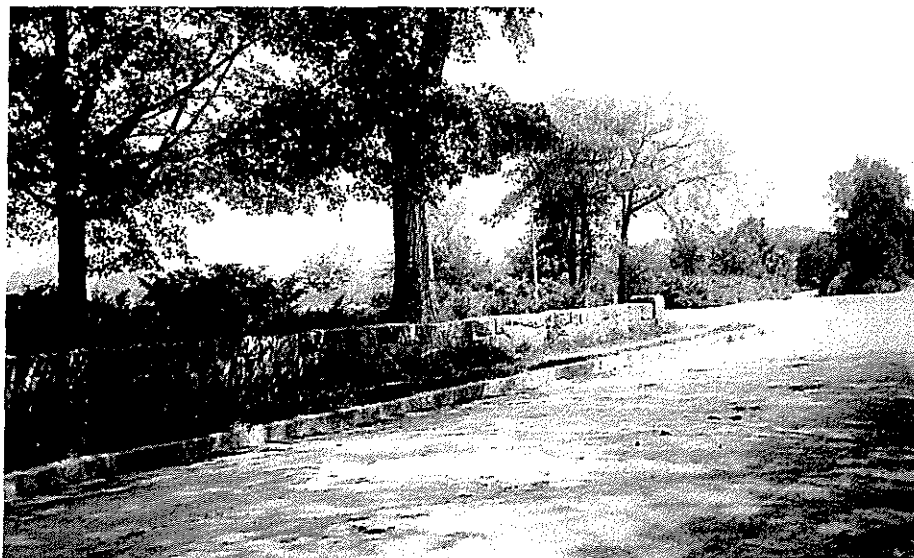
Parkway looking from Prince Street showing wall, curb, and planting, no date, FLONHS.
